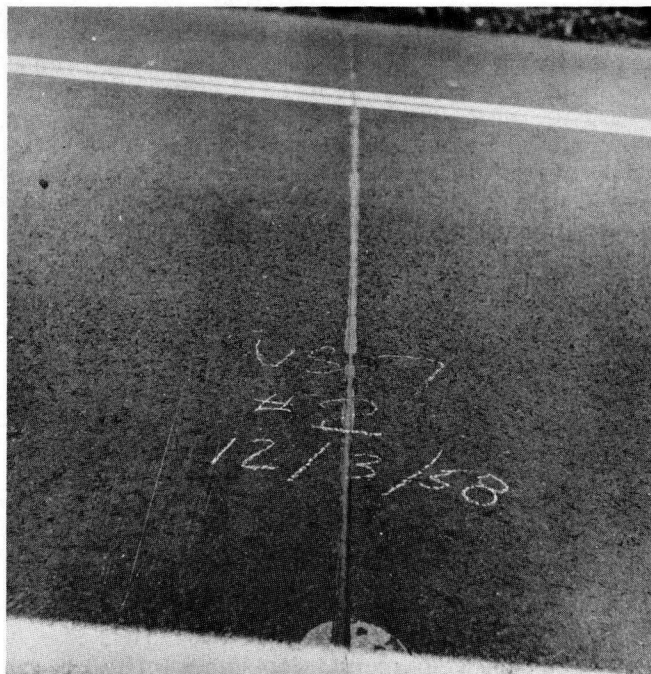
Controlled Joint Crack Project No. 1—Route US 7, Norwalk, December 3, 1958.
